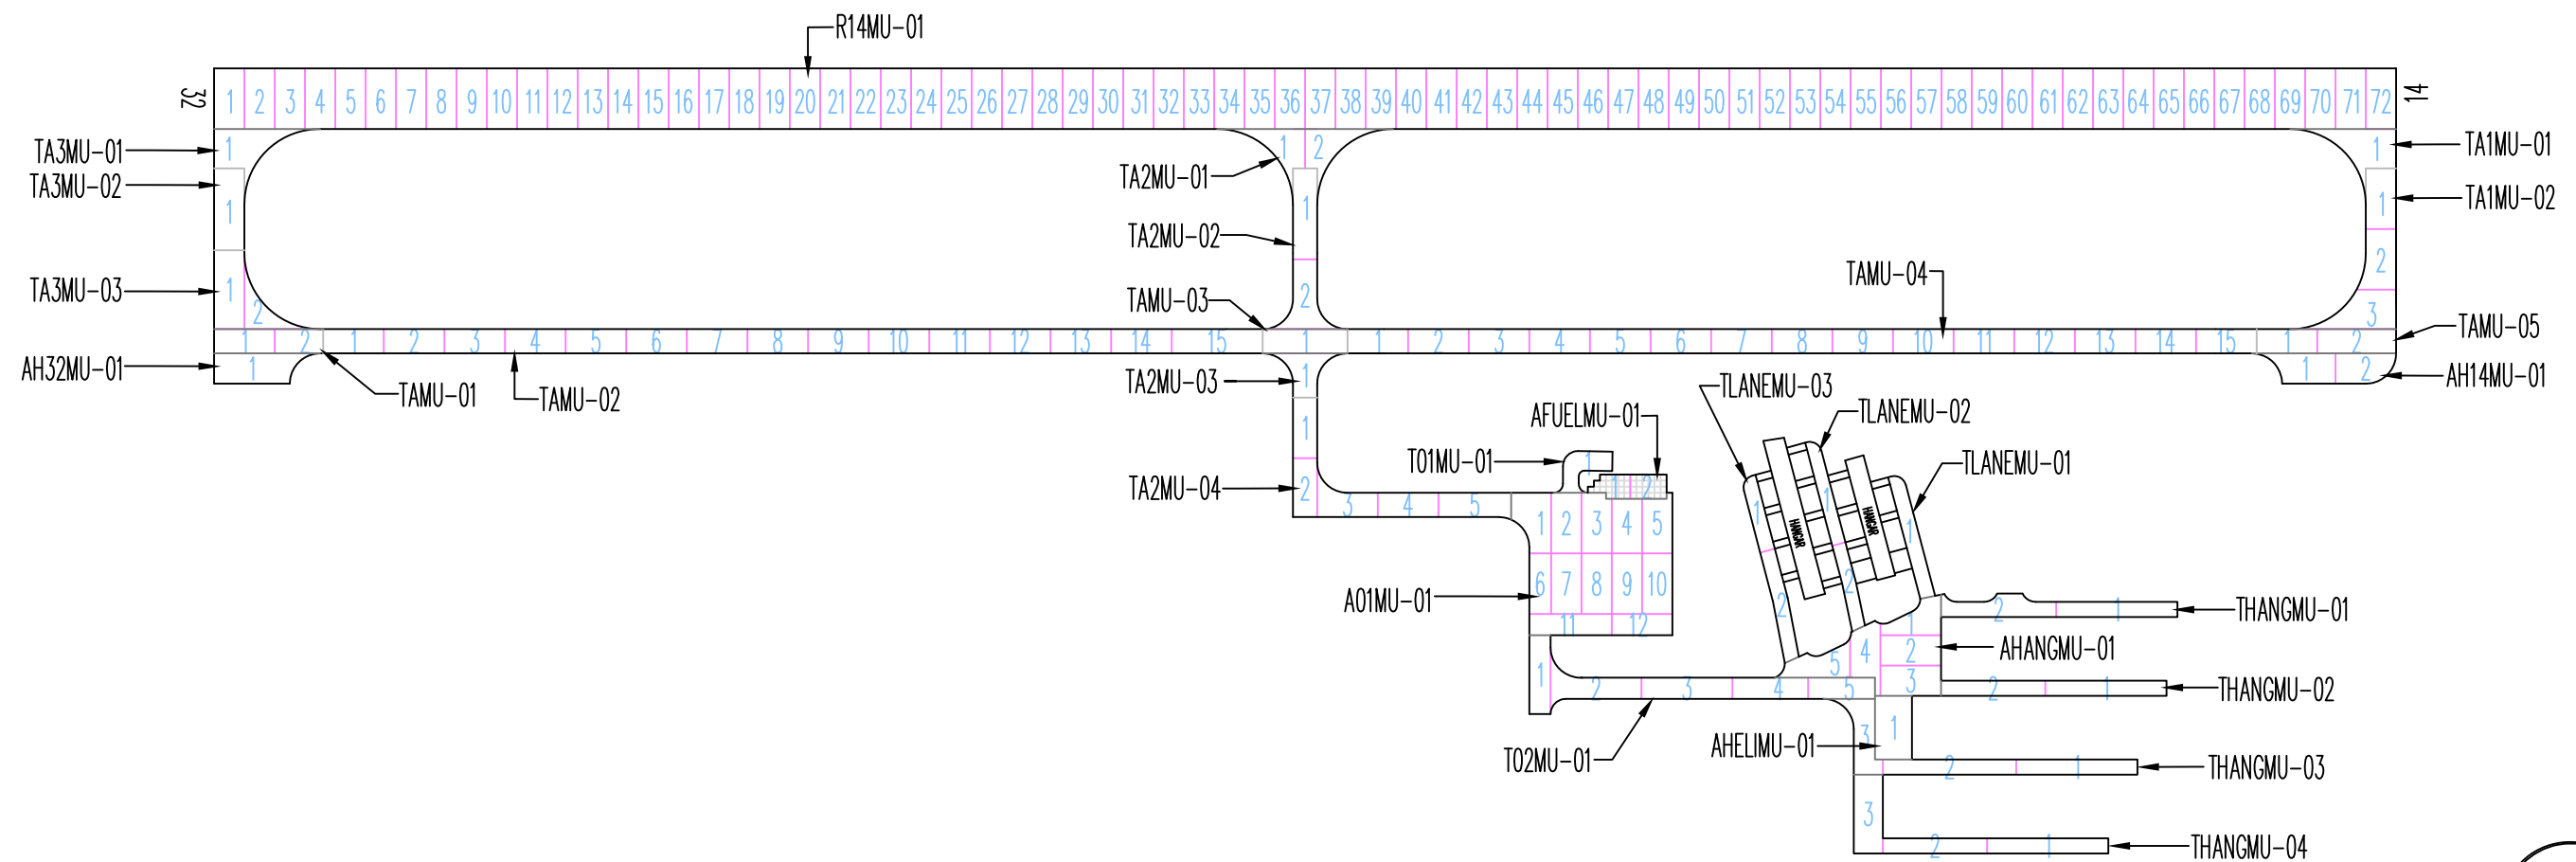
Pavement Branch, Section and Sample Unit Layout.
